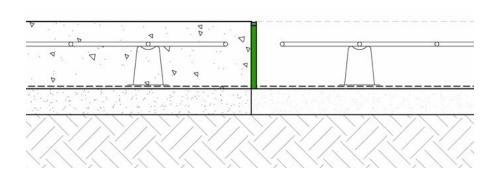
B Not all slab joints require dowels to be inserted.
